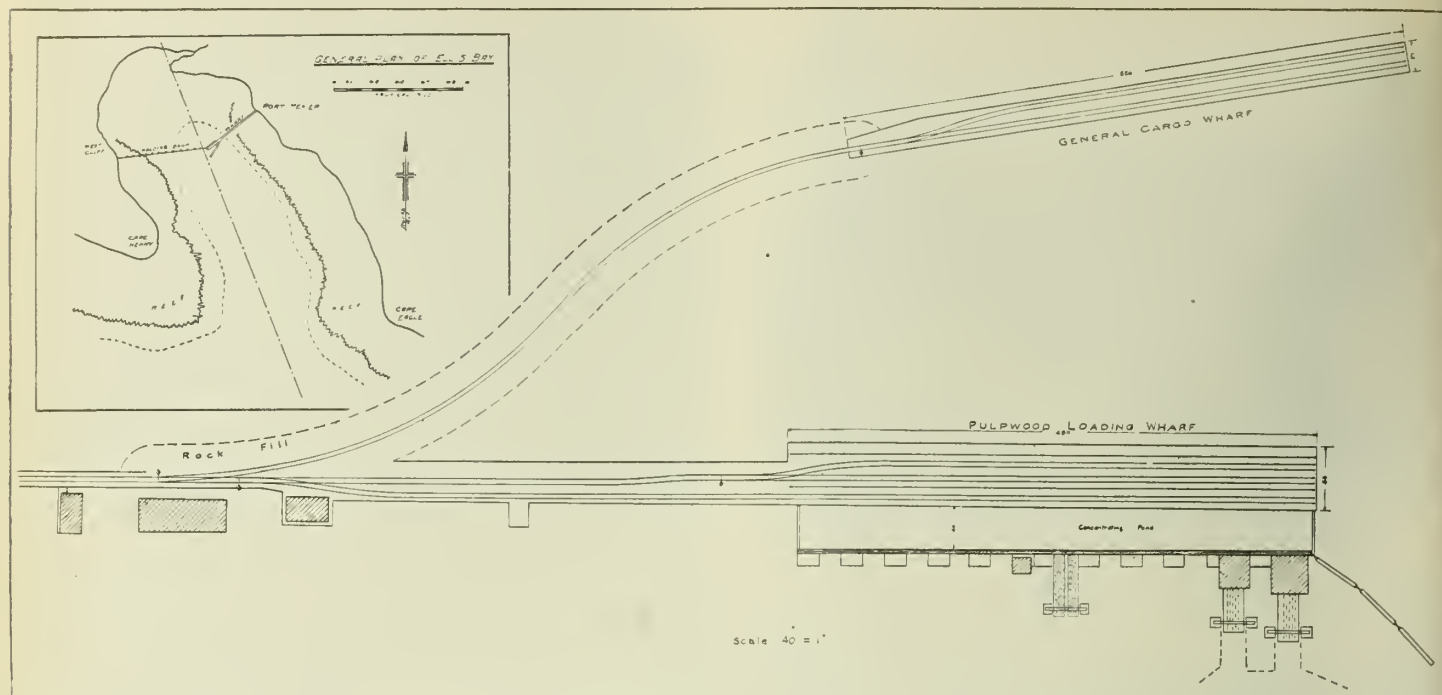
General Plan of Ellis Bay; General Cargo Wharf and Pulpwood Loading Wharf.
